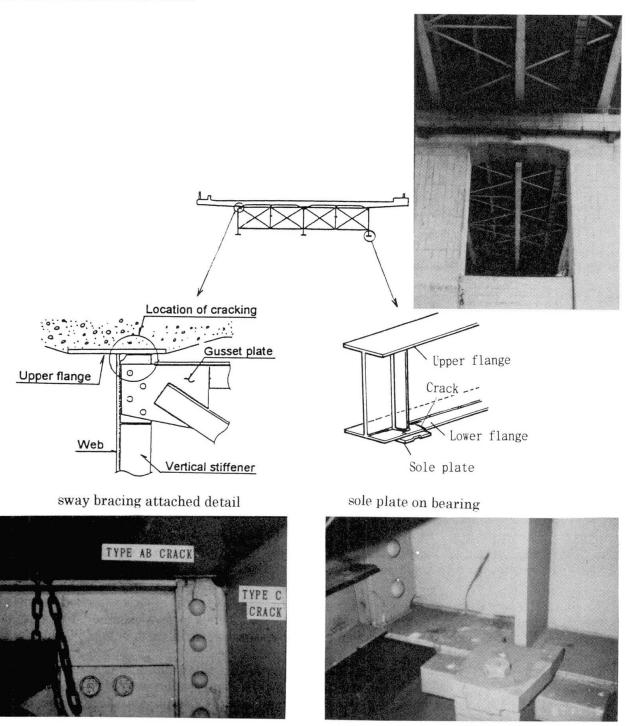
Typical fatigue damage in plate girder bridge
